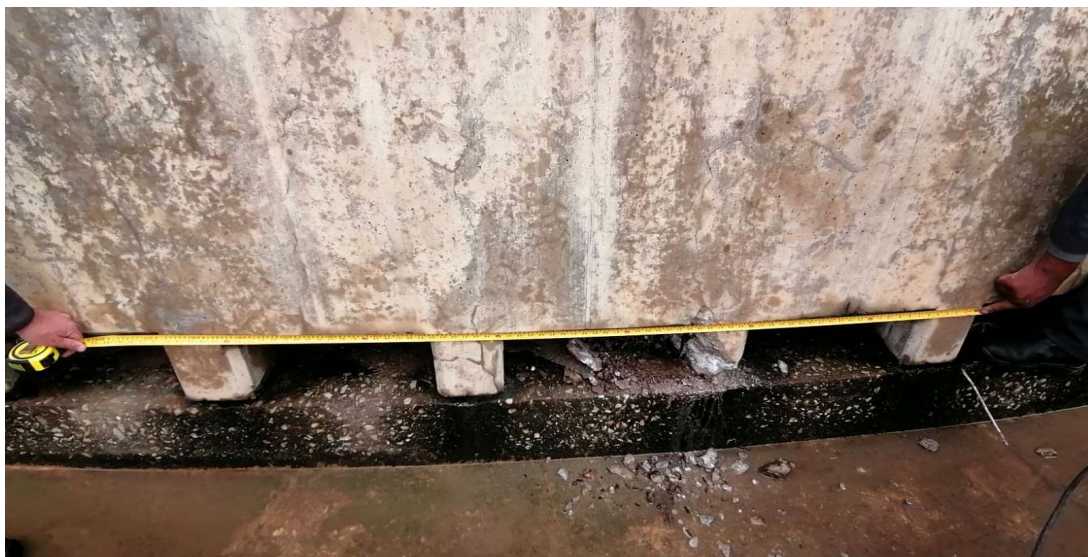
Bio-trickling filter walls can be seen as resting on the floor slab and not integrated into the floor slab.
